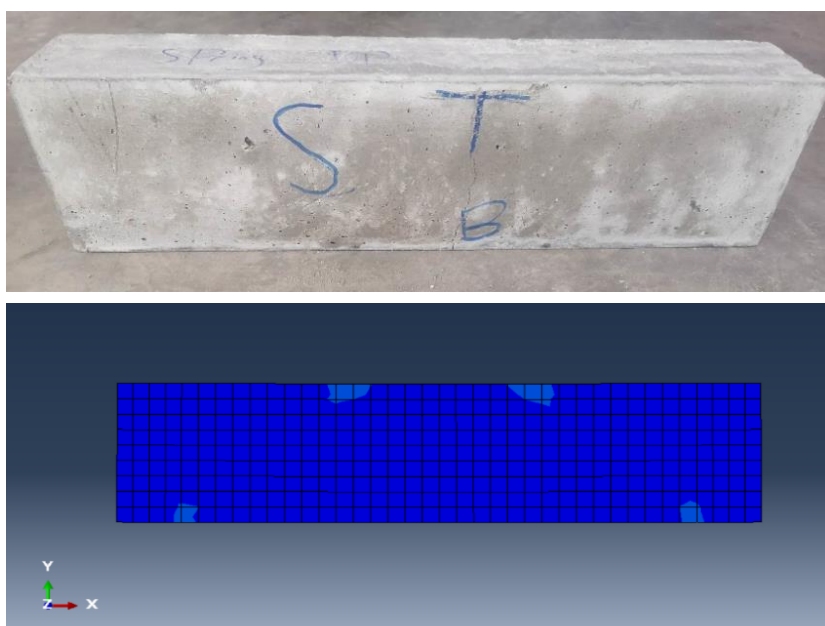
Plain Concrete Beam - Under the Flexural Stresses
